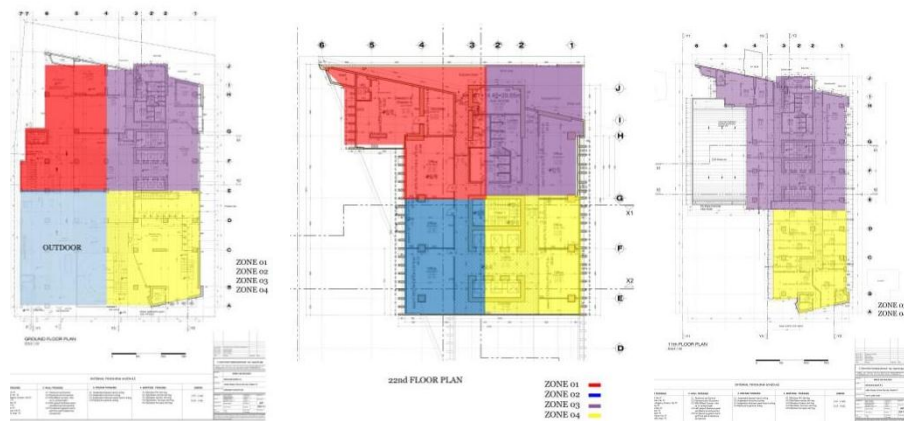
wegagen Sample Building plan divided into four zones per floor.
